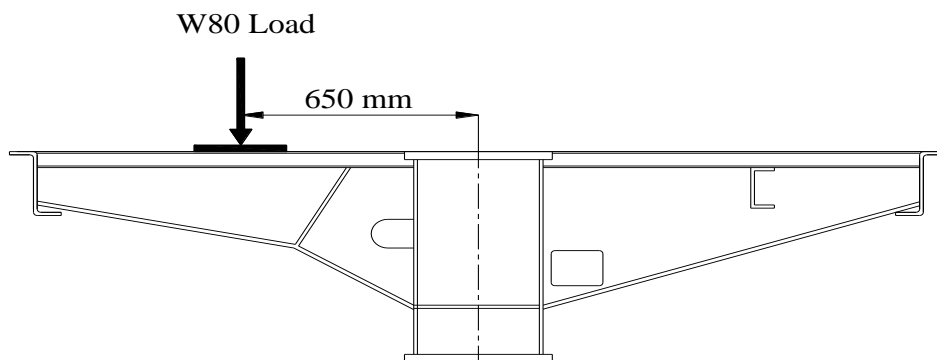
W80 load; offset to check bending capacity of cross girder
